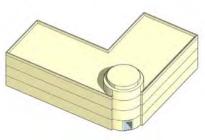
Basic massing, articulation, and opening strategies should relate to each other and break down the scale of the buildings.
